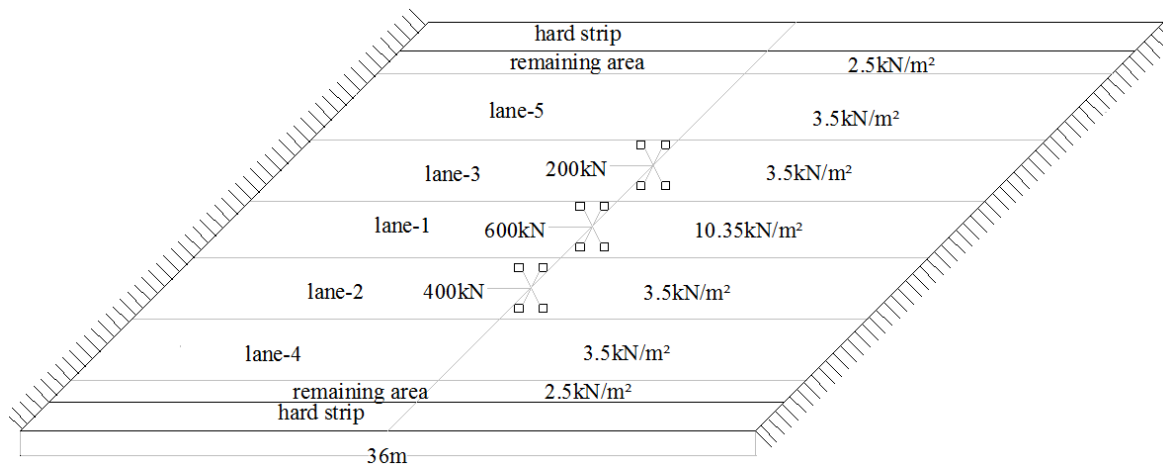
9, Load case -3 (load arrangement for maximum transverse moment in the deck)
